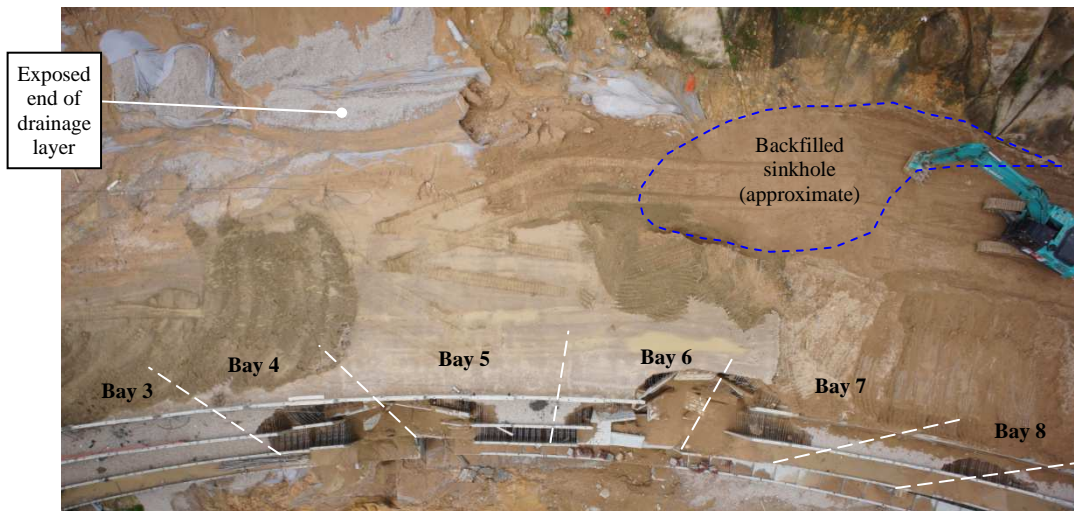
Distressed Zone at Bays 4/5 of Wall R22 (Photographs taken on 22 and 23 May 2013)
